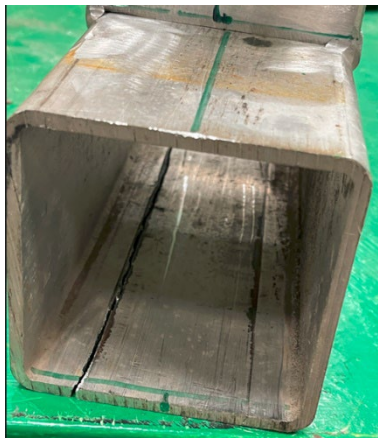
Tear out failure occurring in R-HG specimen due to undersized fixture bar.
